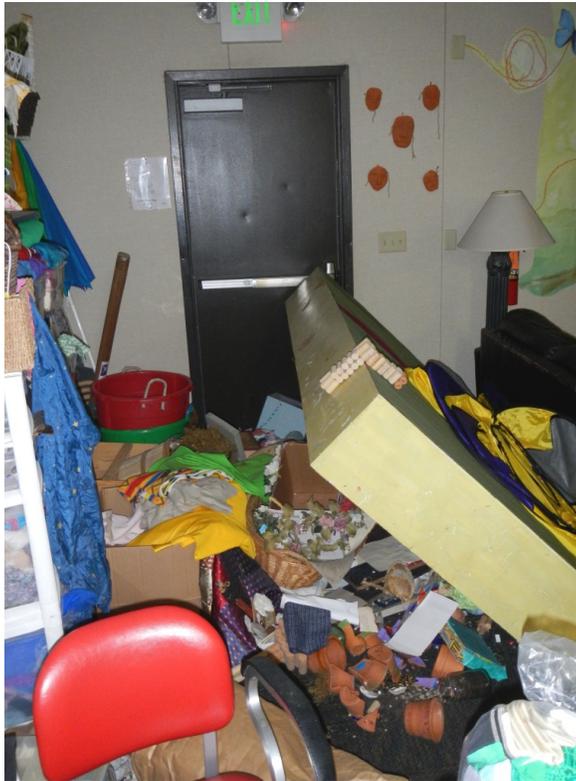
Overturned bookcase blocking exit in Stone Bridge School (photo by Quattrocchi Kwok Architects).
